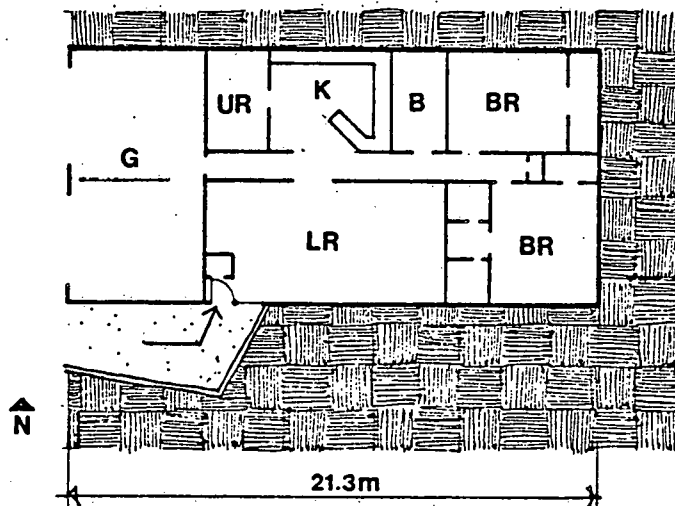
Site D is a bermed and windowless concrete structure having a bar joist roof assembly. The garage and entry face to the southwest.
